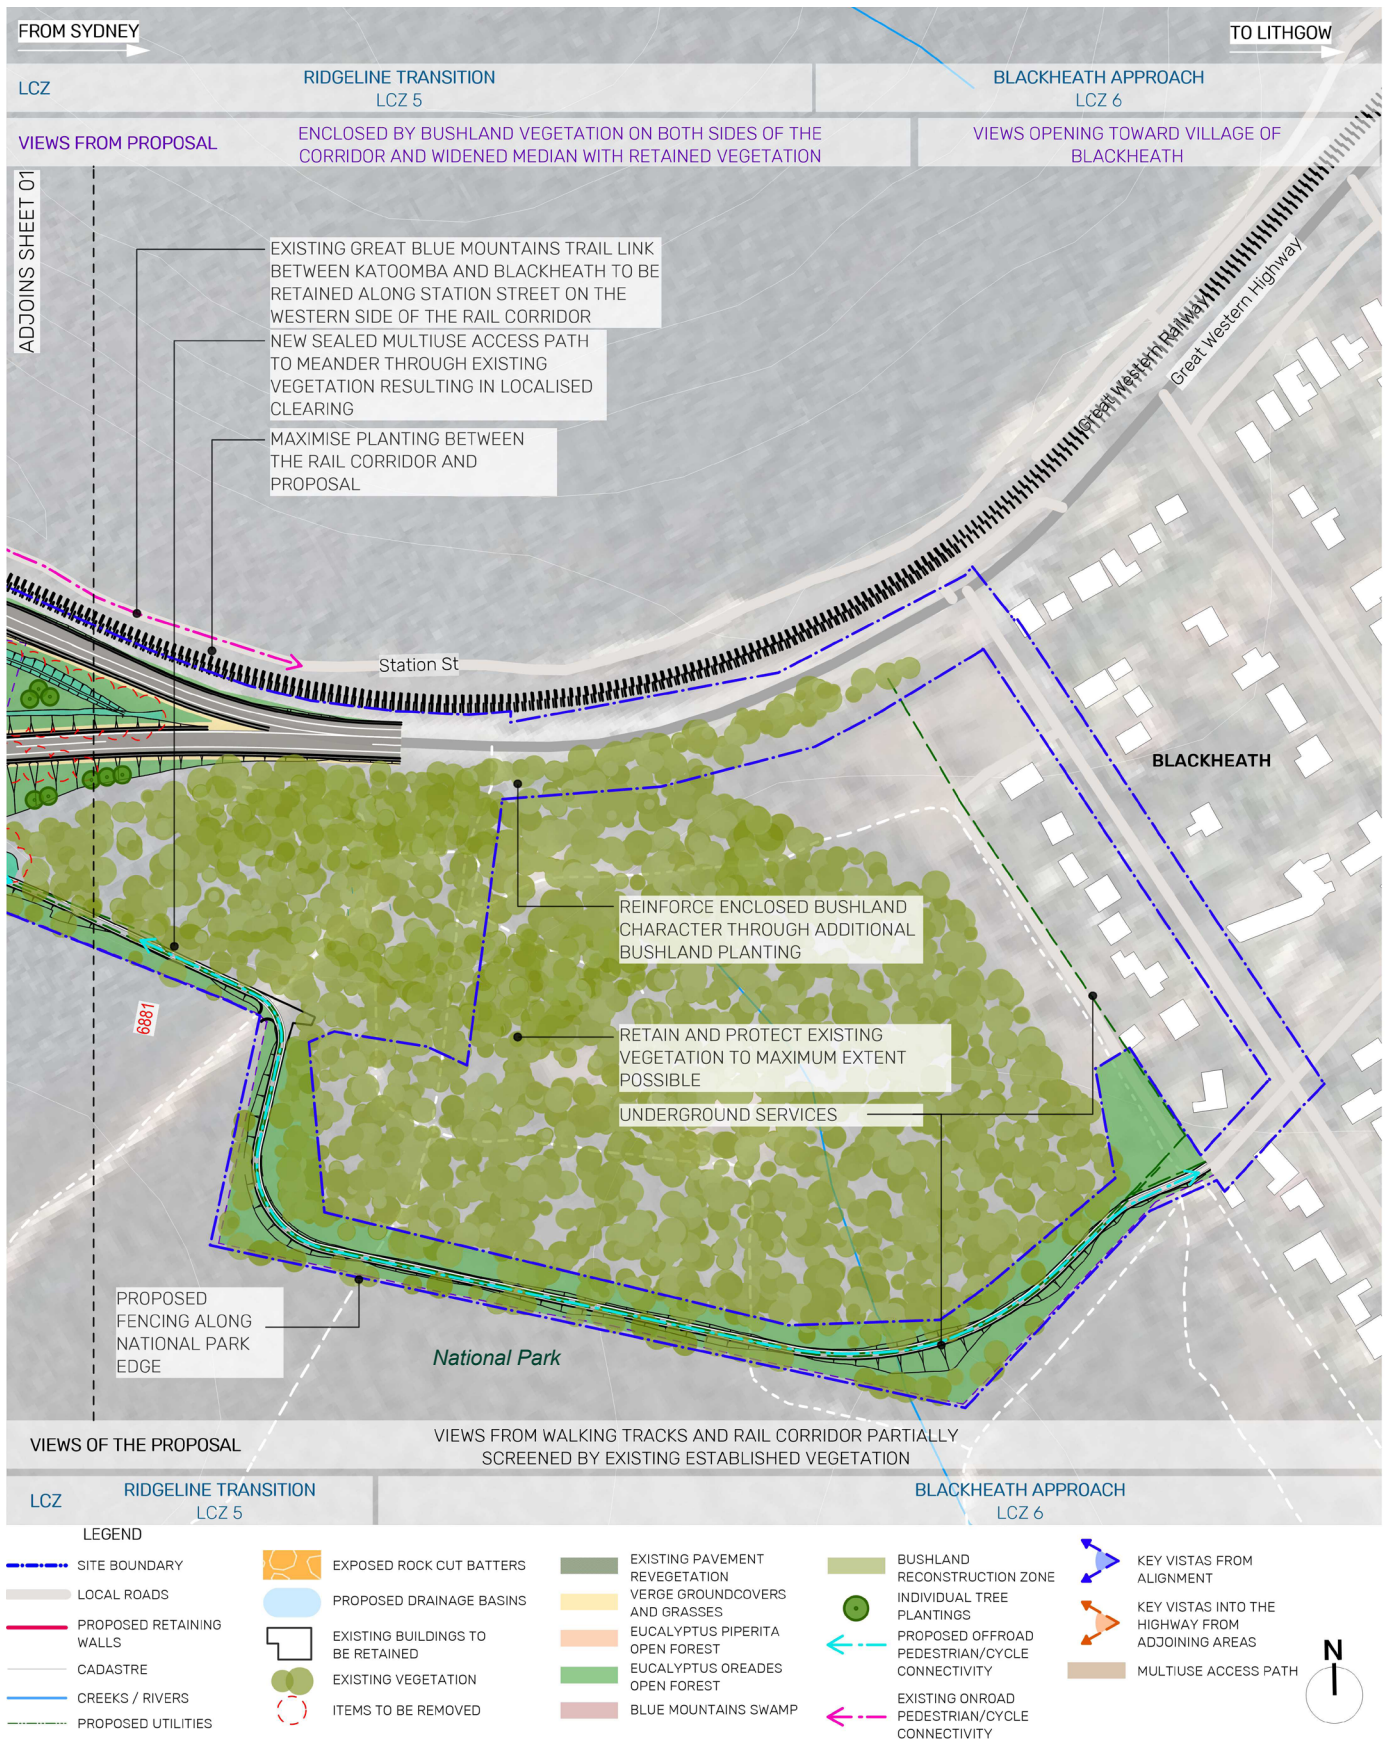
Urban Design and Landscape Plan Additional Scope 1
